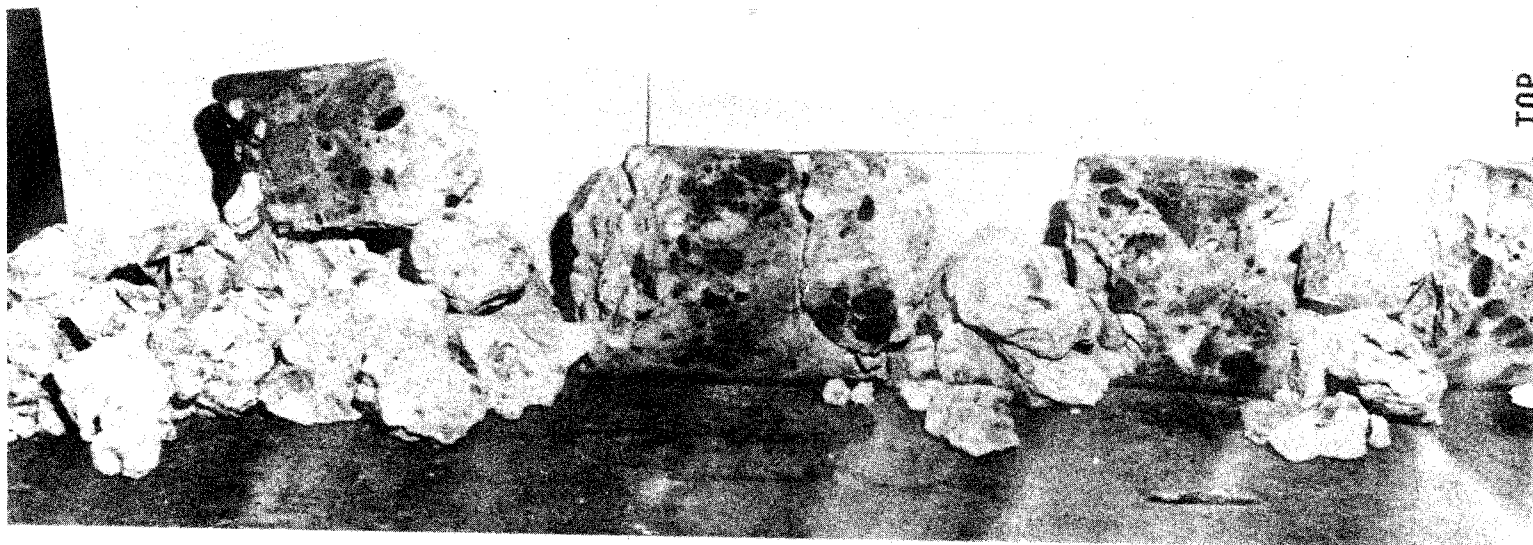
Top view showing major cracks and locations of injection ports (Flock and Walleser, 1983).
